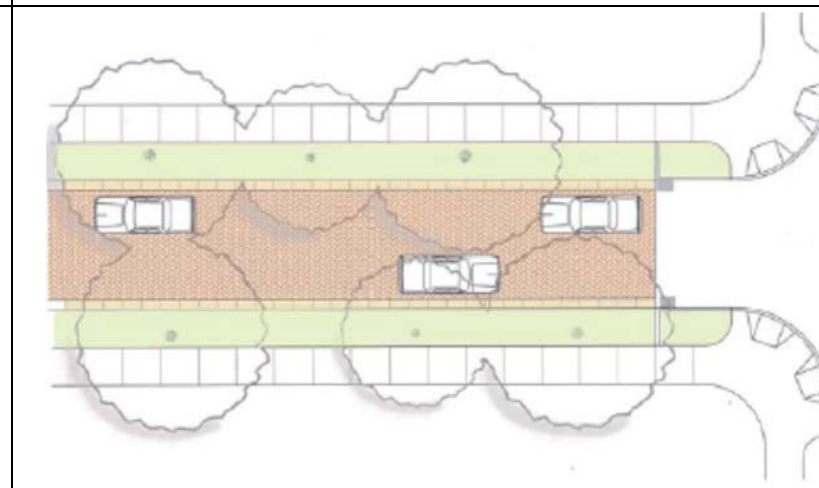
Flat Street Profile. Flat streets are designed to drain through pervious paving. While these facilities do not have a marked slope, they may be graded slightly so that they drain to the sides or center of the street when there is too much water.
